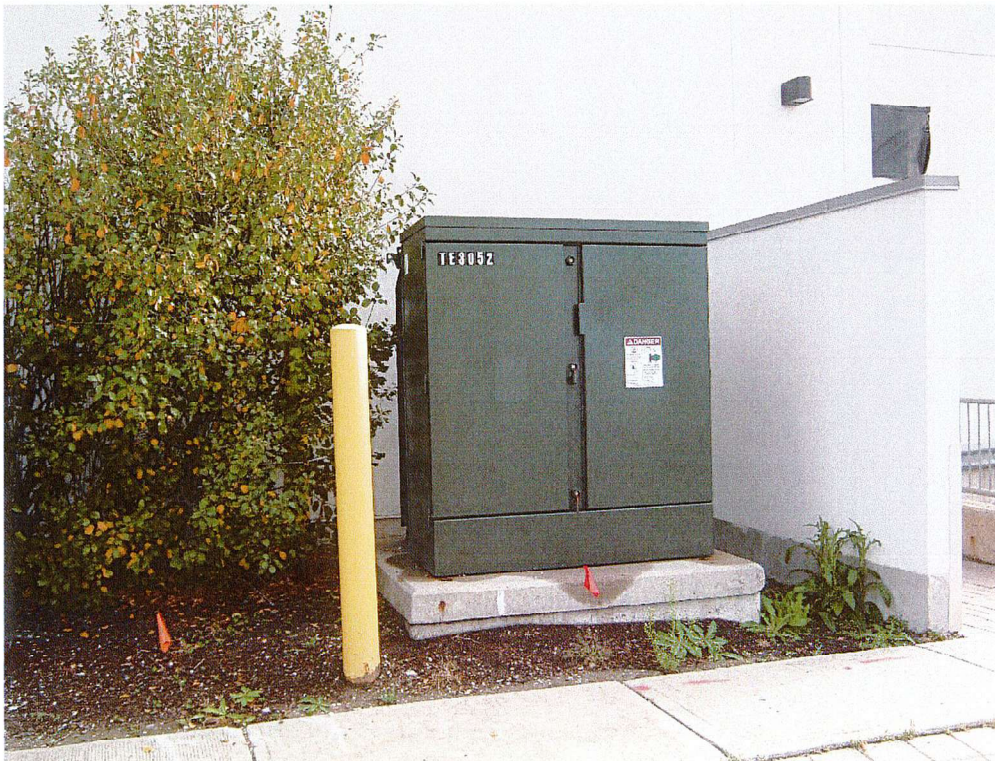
View of an electrical transformer located on the neighbouring LCBO property to the east.
